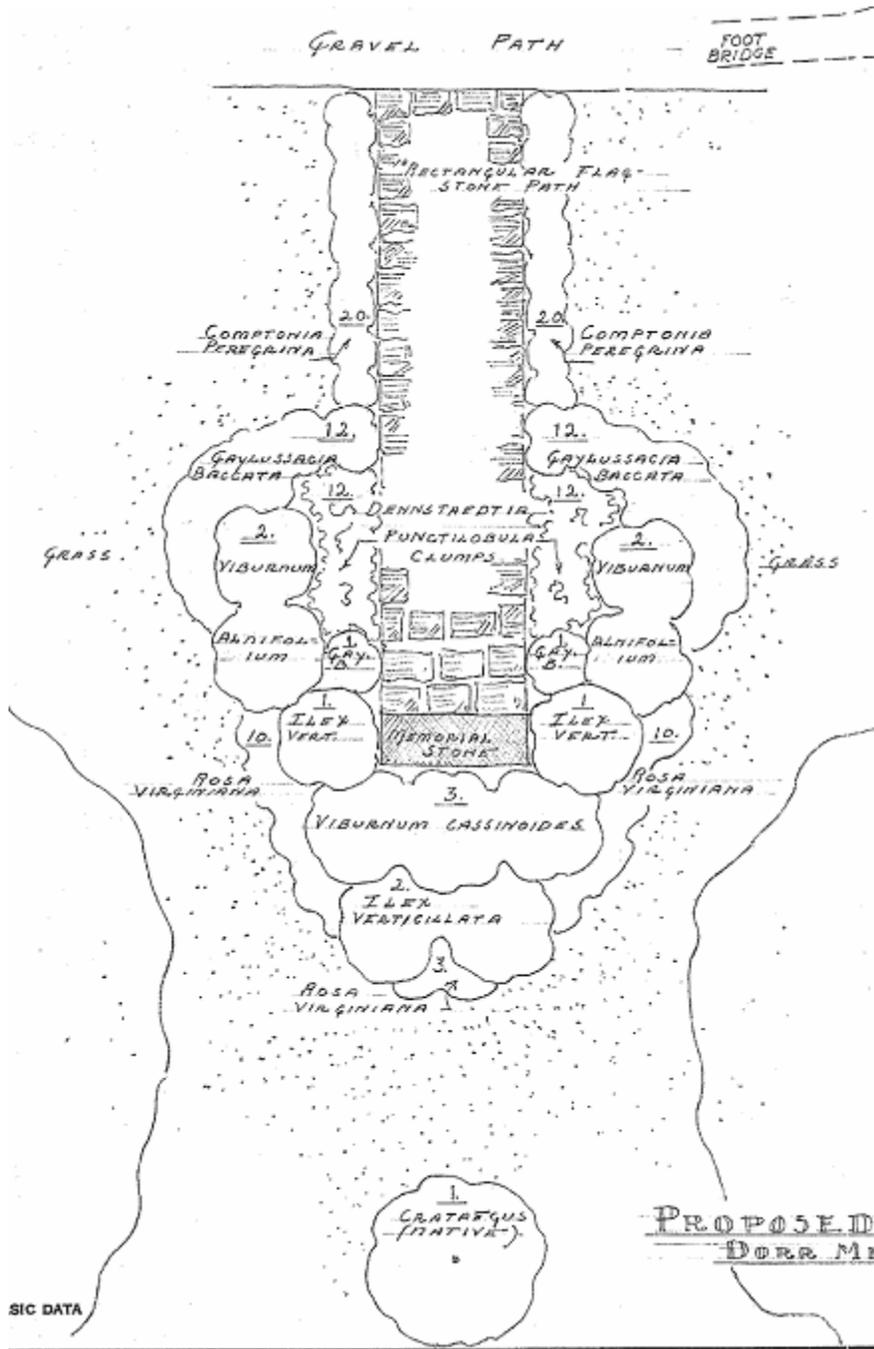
Plan of the rebuilt Dorr memorial, path, and plantings, 1948.
